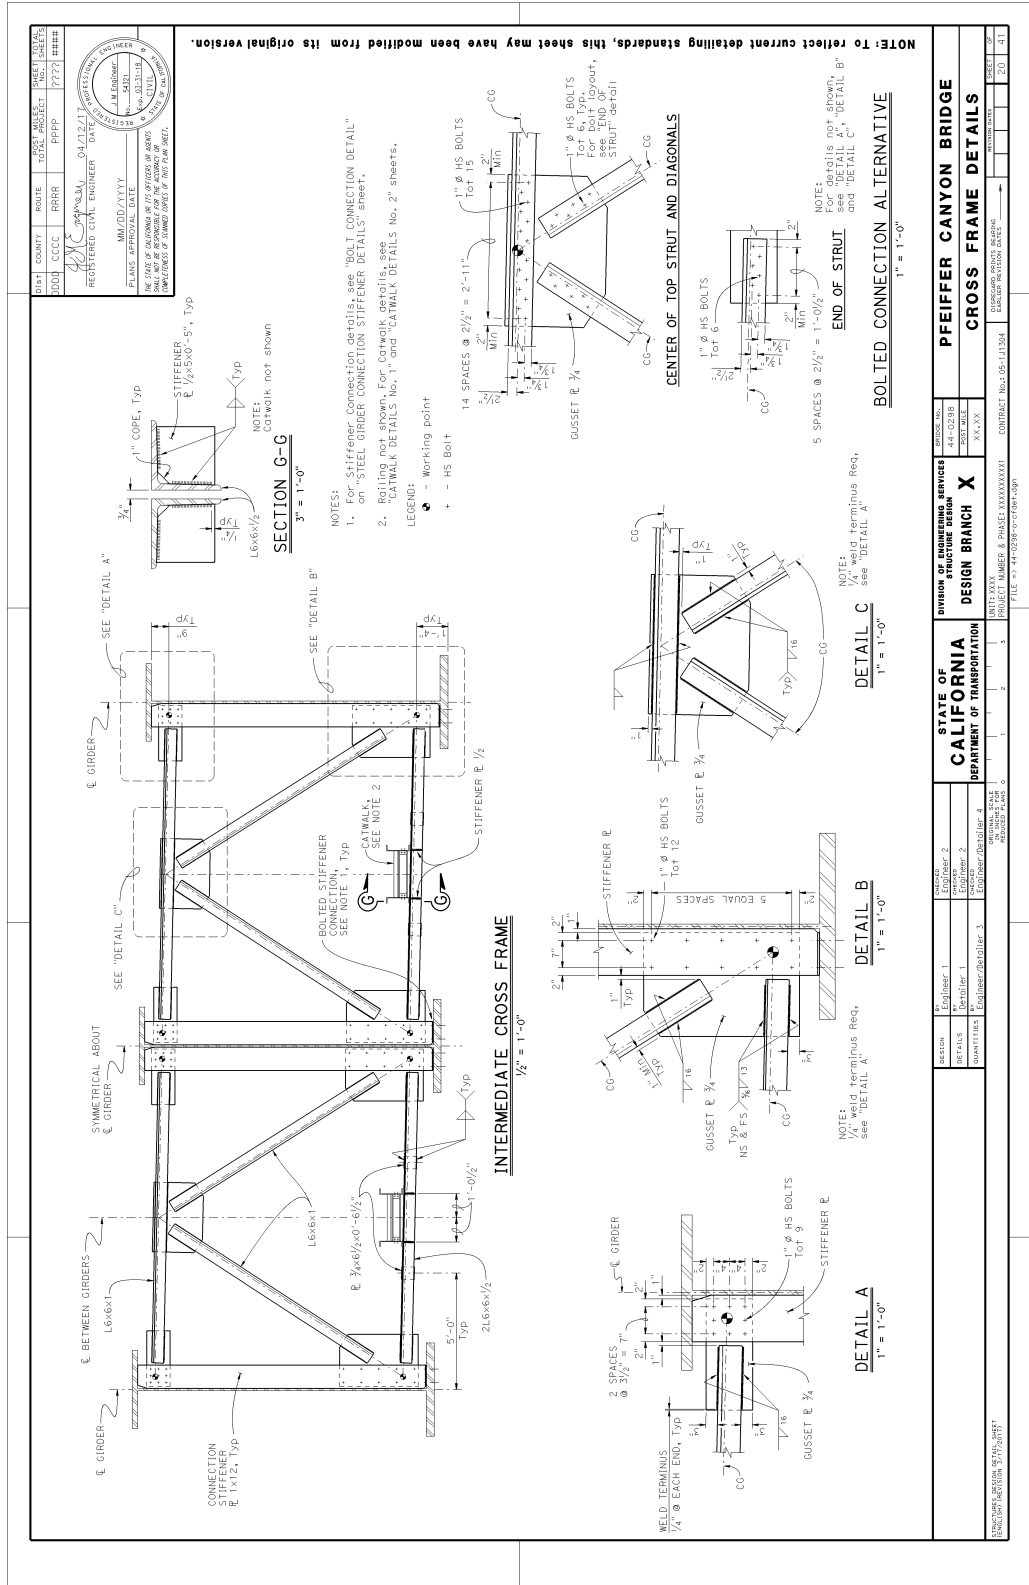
A.A.6 Steel Girder Bridge Detailing Example 6
